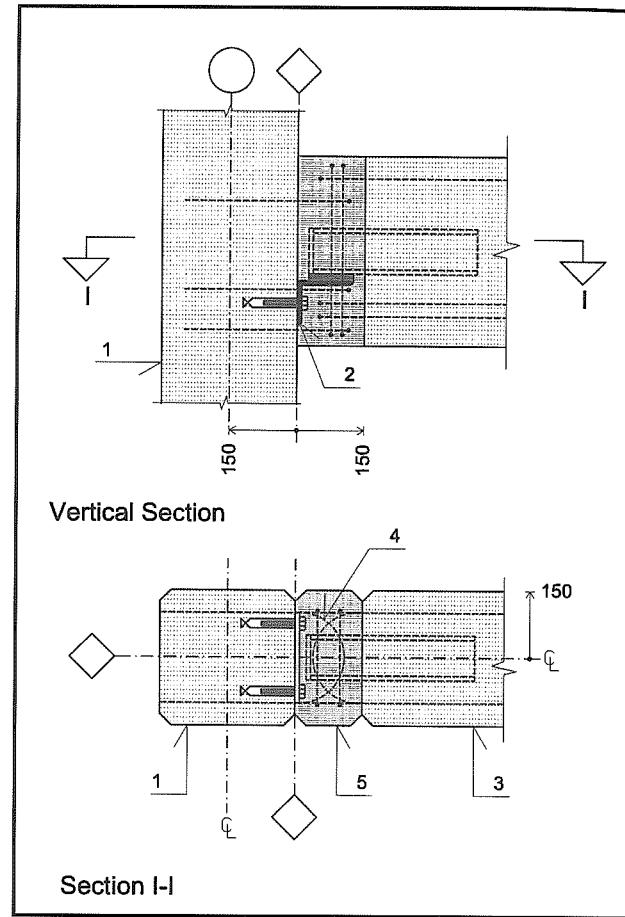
Column/Beam Connection With Temporary Steel Section Supports
